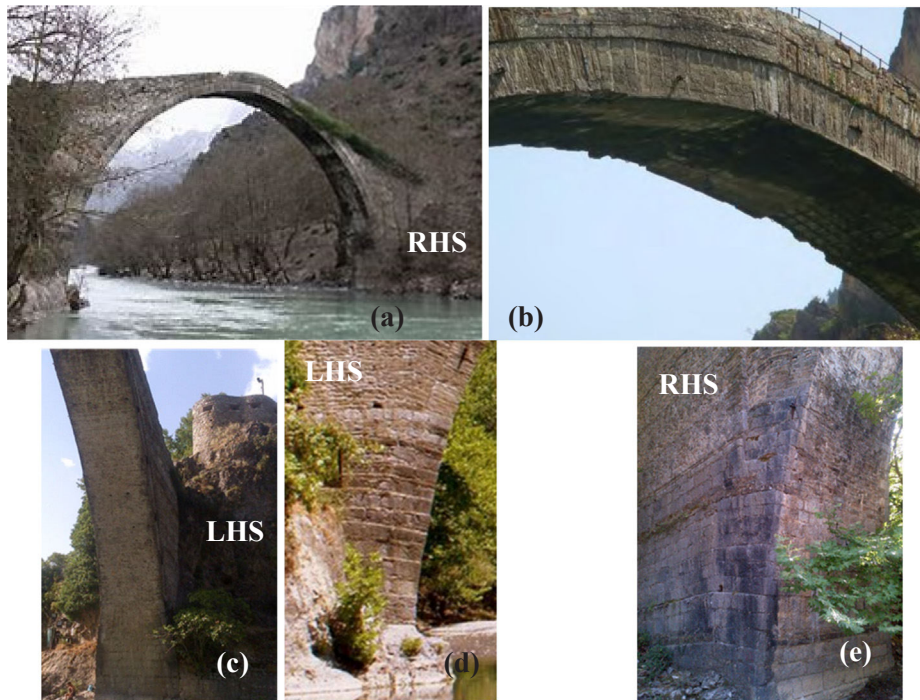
(a) General view, (b) primary arch restoration including steel mesh addition, (c–d) LHS abutment foundation, and (e) RHS abutment foundation details of the Konitsa Bridge.
